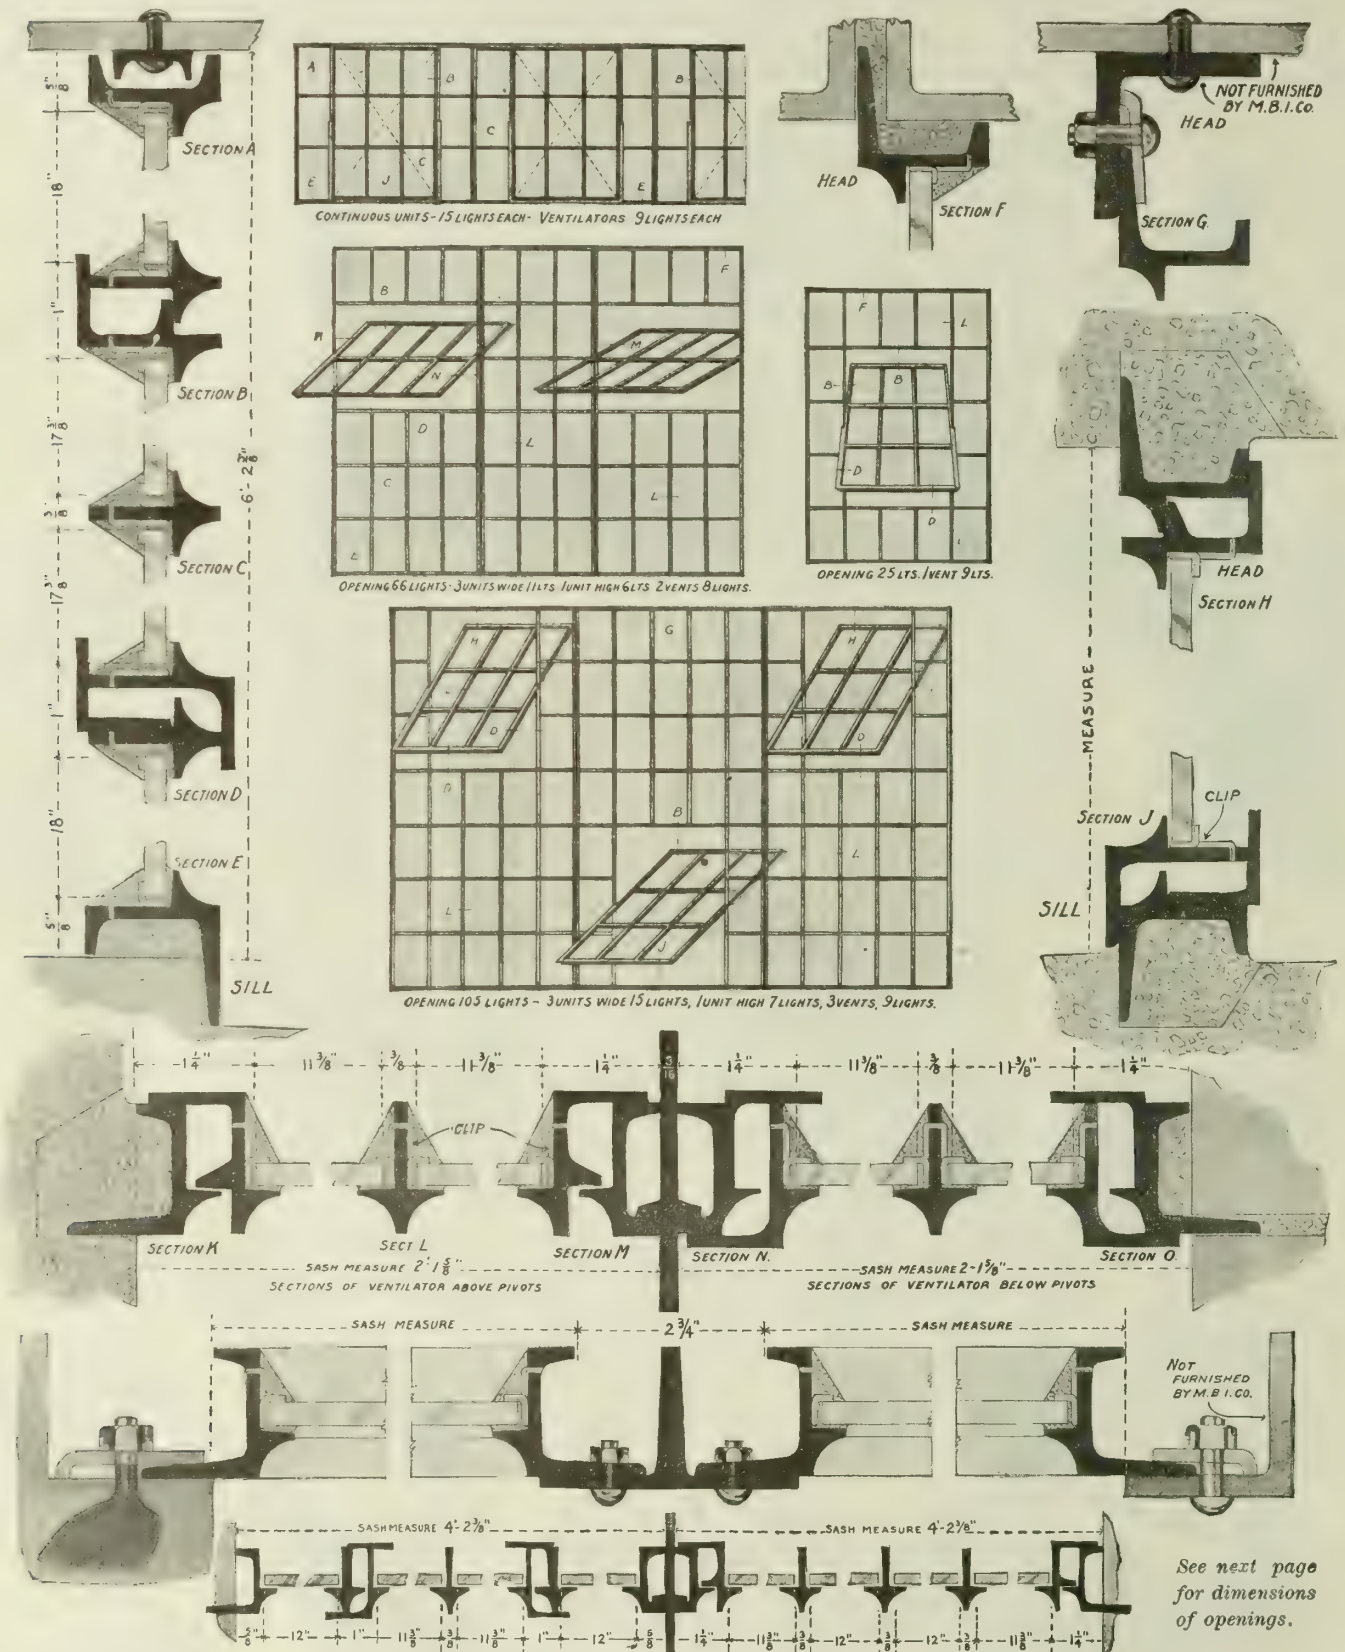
DETAILS OF MESKER SOLID SECTION STEEL SASH
